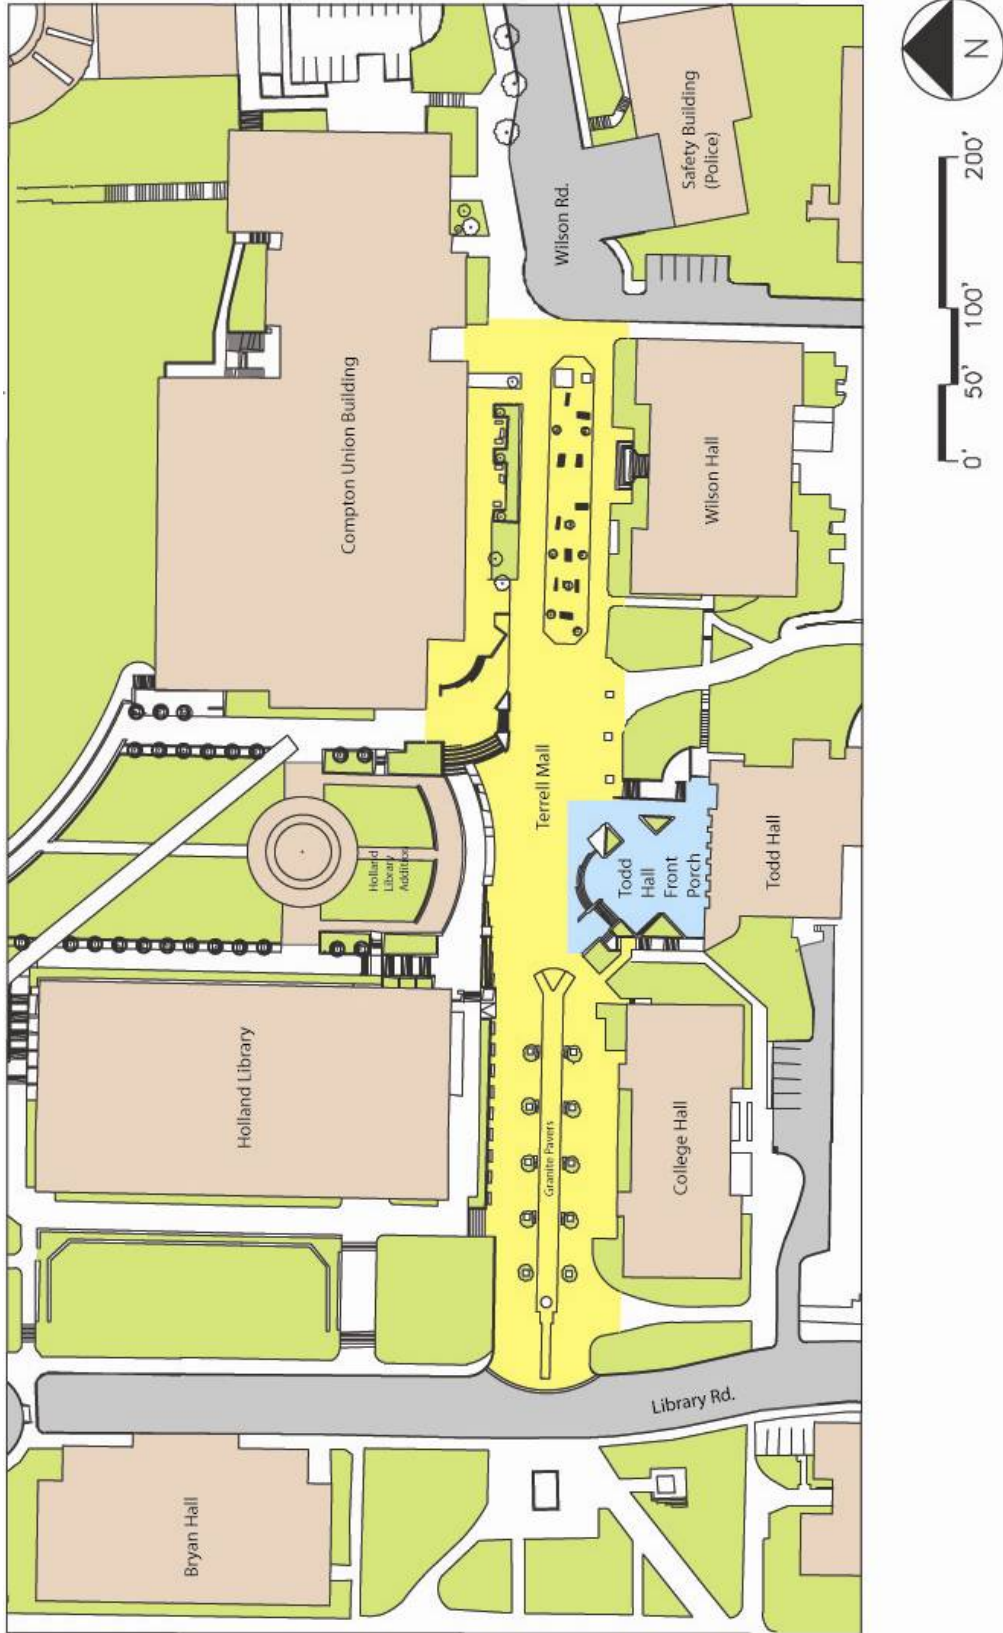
Plan view of Terrell Mall, Todd Hall front porch and surrounding buildings
